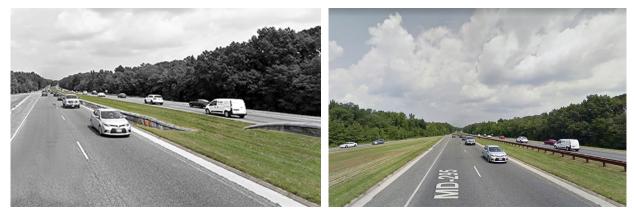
Proposed guard walls (left), existing guard rail (right).
